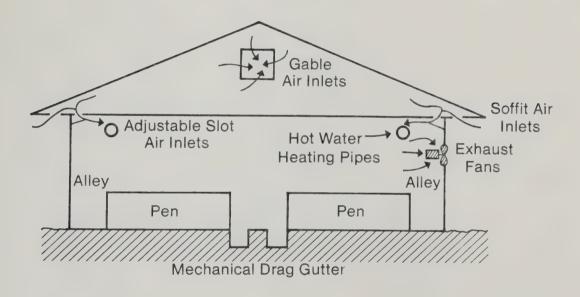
An end-view schematic of barn SO-1 showing some ventilation and structural details.
